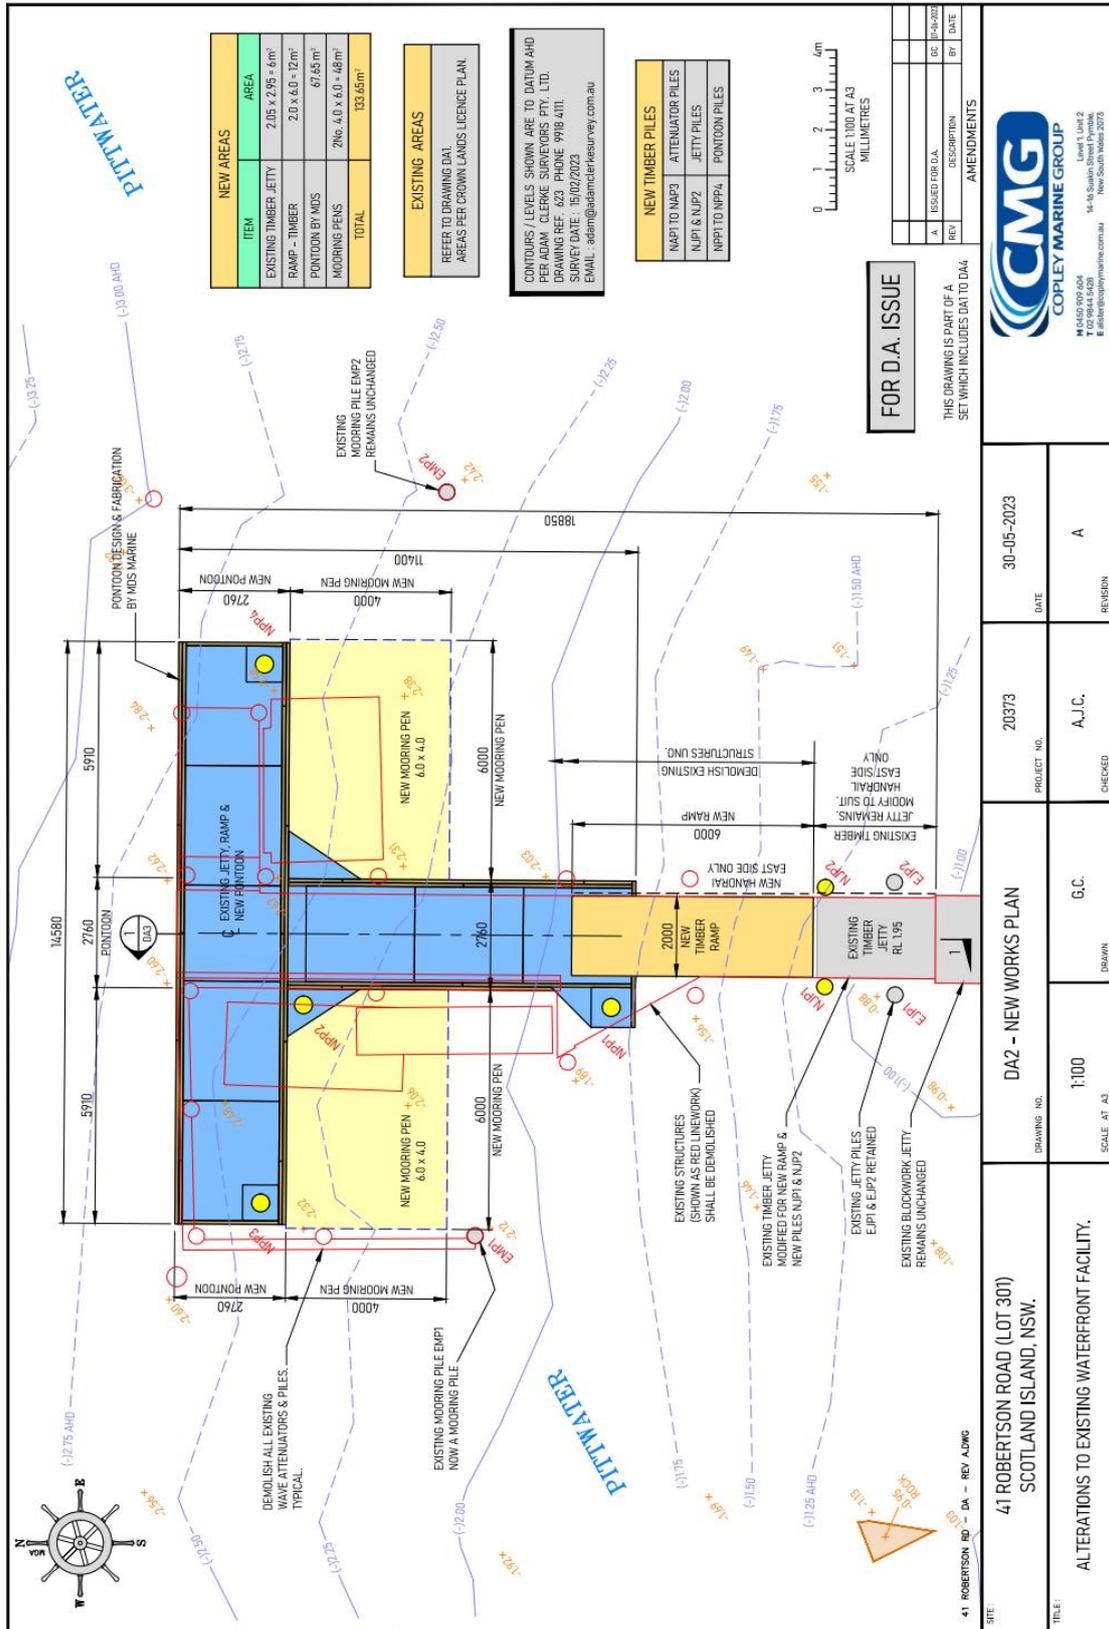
Proposed modifications to the waterfront structures at the Subject Site.
